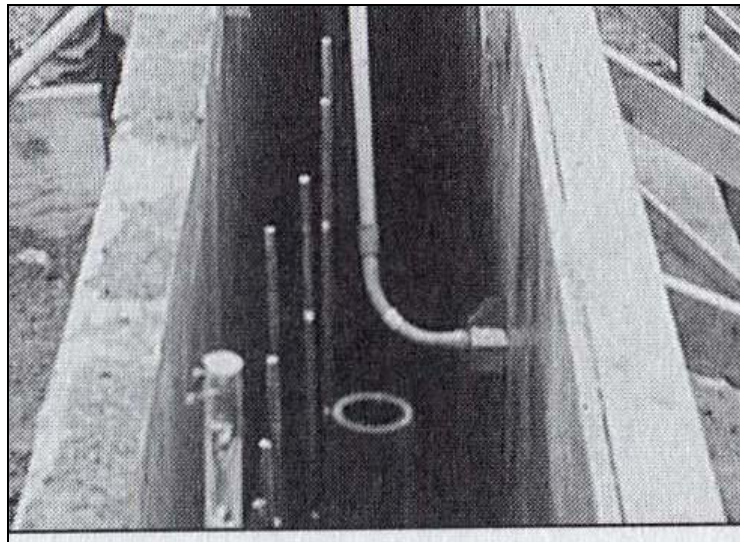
Steel Reinforcement in Formwork. Steel reinforcement bars are incorporated into monolithic earth walls for added strength (Elizabeth, 2005).
